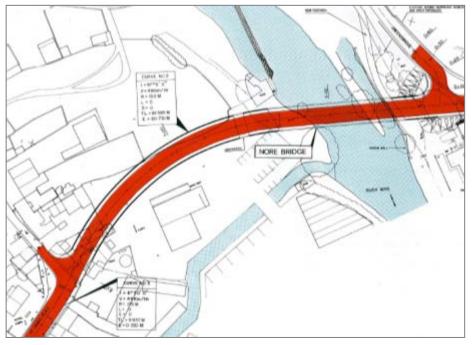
'Horizontal Alignment of Proposed Bridge' (Source: *Kilkenny Inner Relief Road Bridge –Preliminary Report,* McCarthy and Partners, April 1985)
